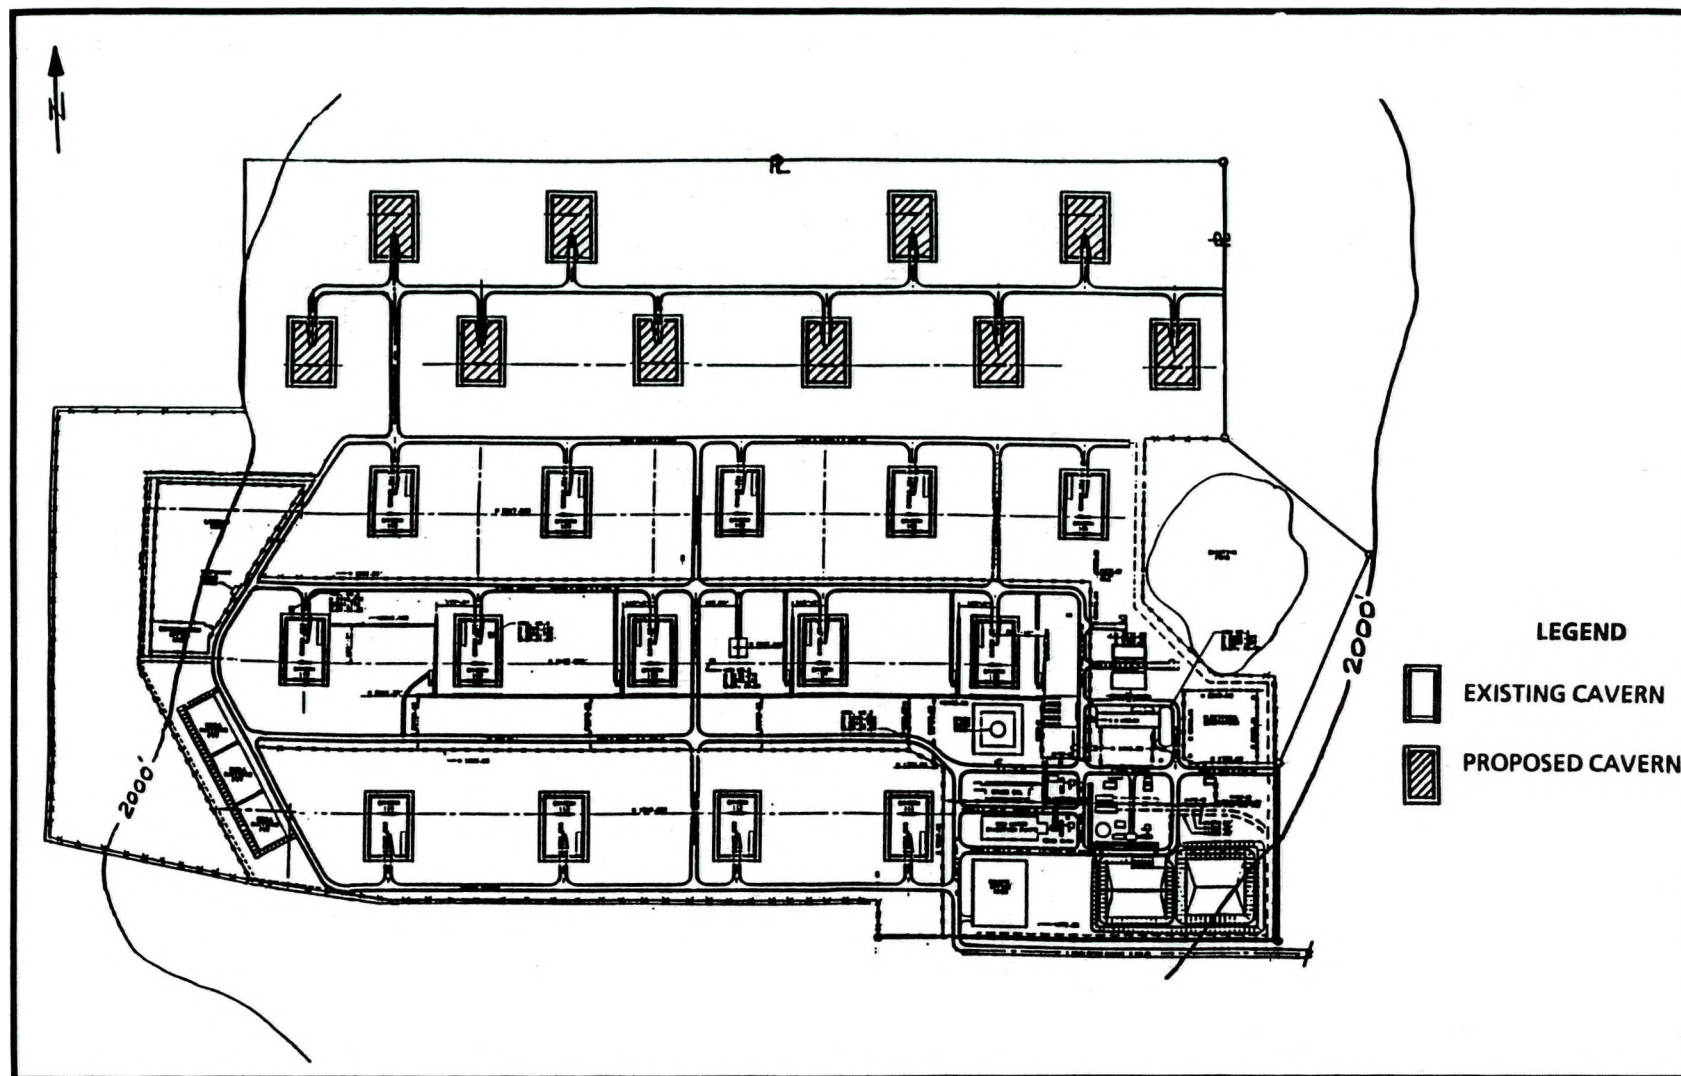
BIG HILL--CONCEPTUAL LAYOUT OF EXISTING AND PROPOSED SPR CAVERNS
